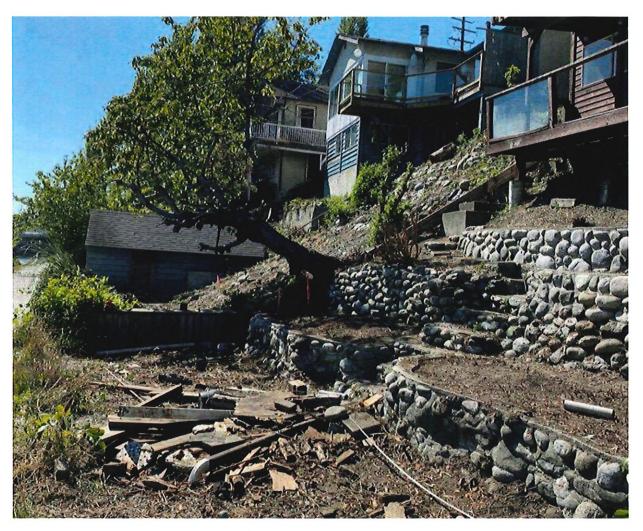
Looking south across neighbors' property towards subject slope. Note neighbor's tiered retaining walls.
